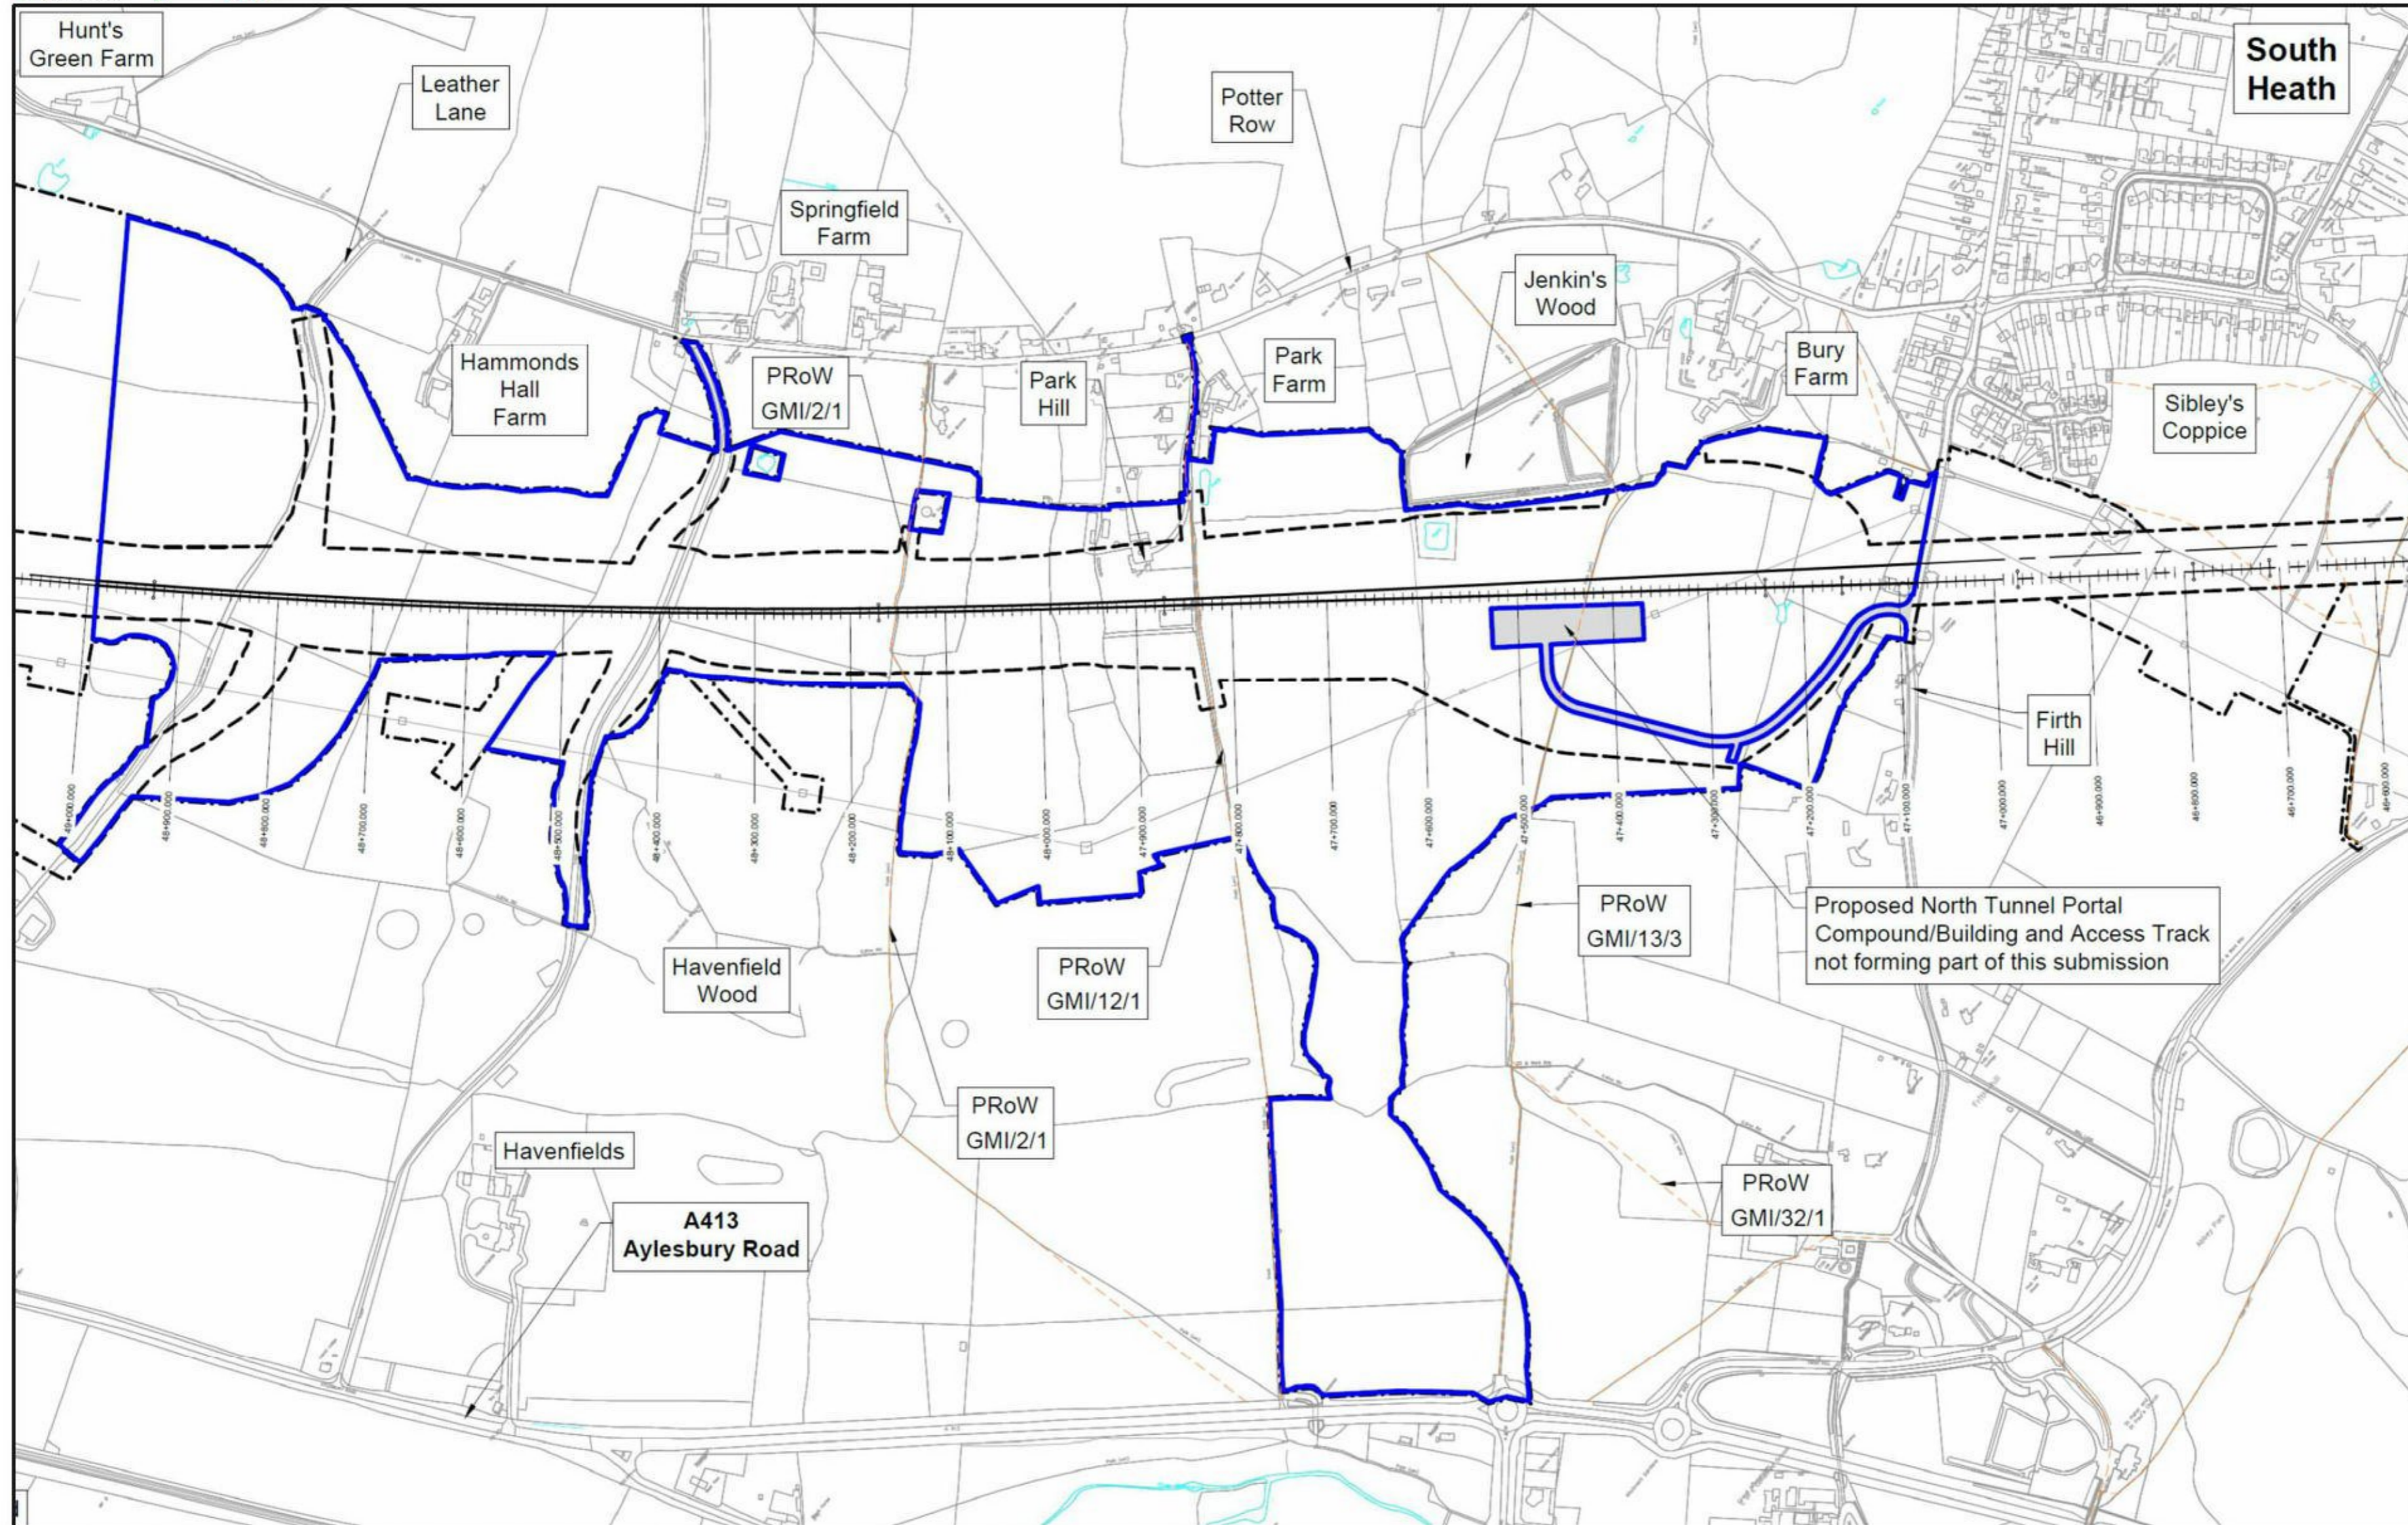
South Heath Cutting Site Location Plan (Drawing No. 1MC06-CEK-TP-DLO-CS03\_CL05-000004) presented in Appendix A
